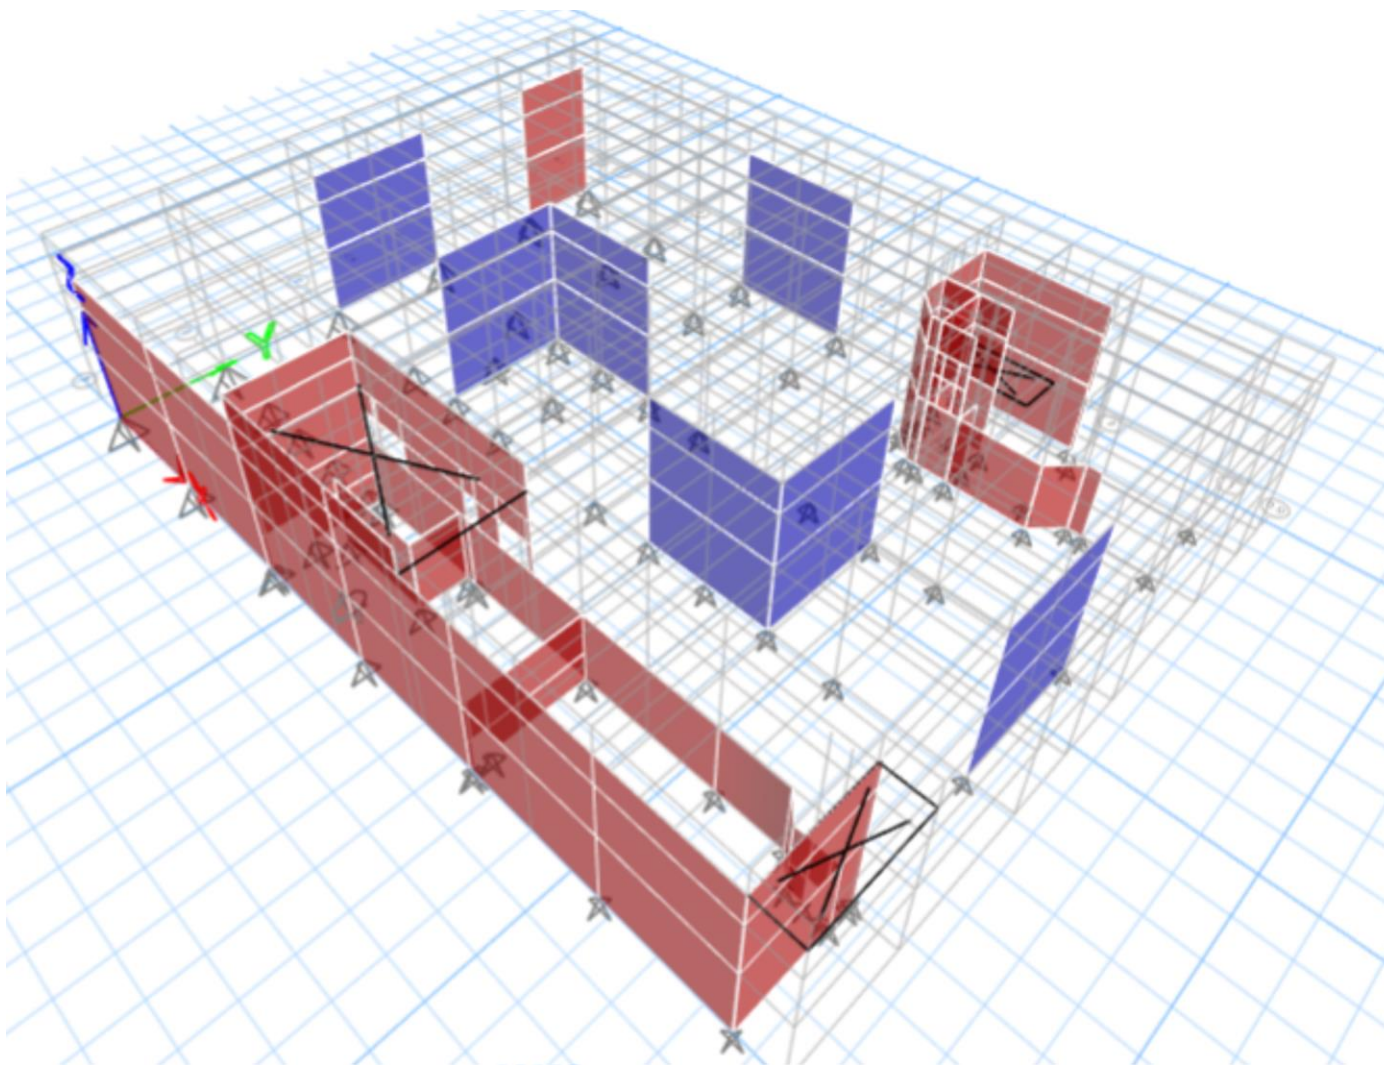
Option No. 1 – ETABS Model – Looking Northwest
